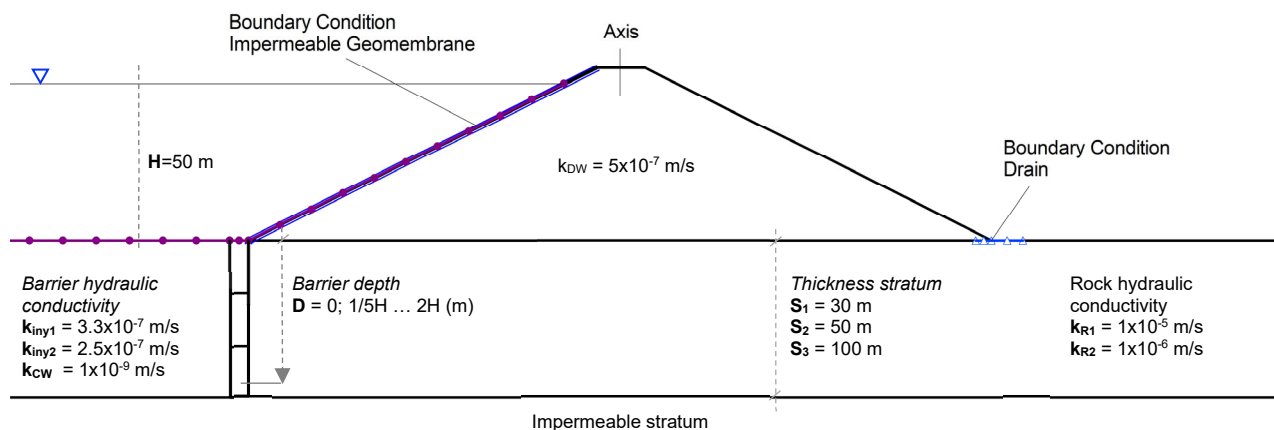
Geometry, boundary conditions, and layout of the hydraulic barrier (1 and 3-line grout curtains, and cut-off wall) considered in the conceptual seepage model.
